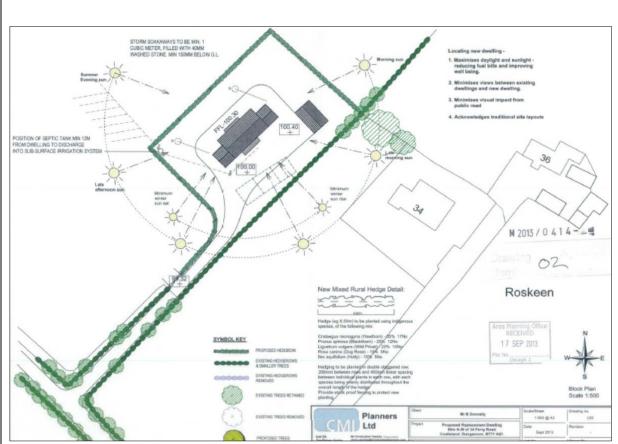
Block plan of dwelling and garage approved under M/2013/0414/F
